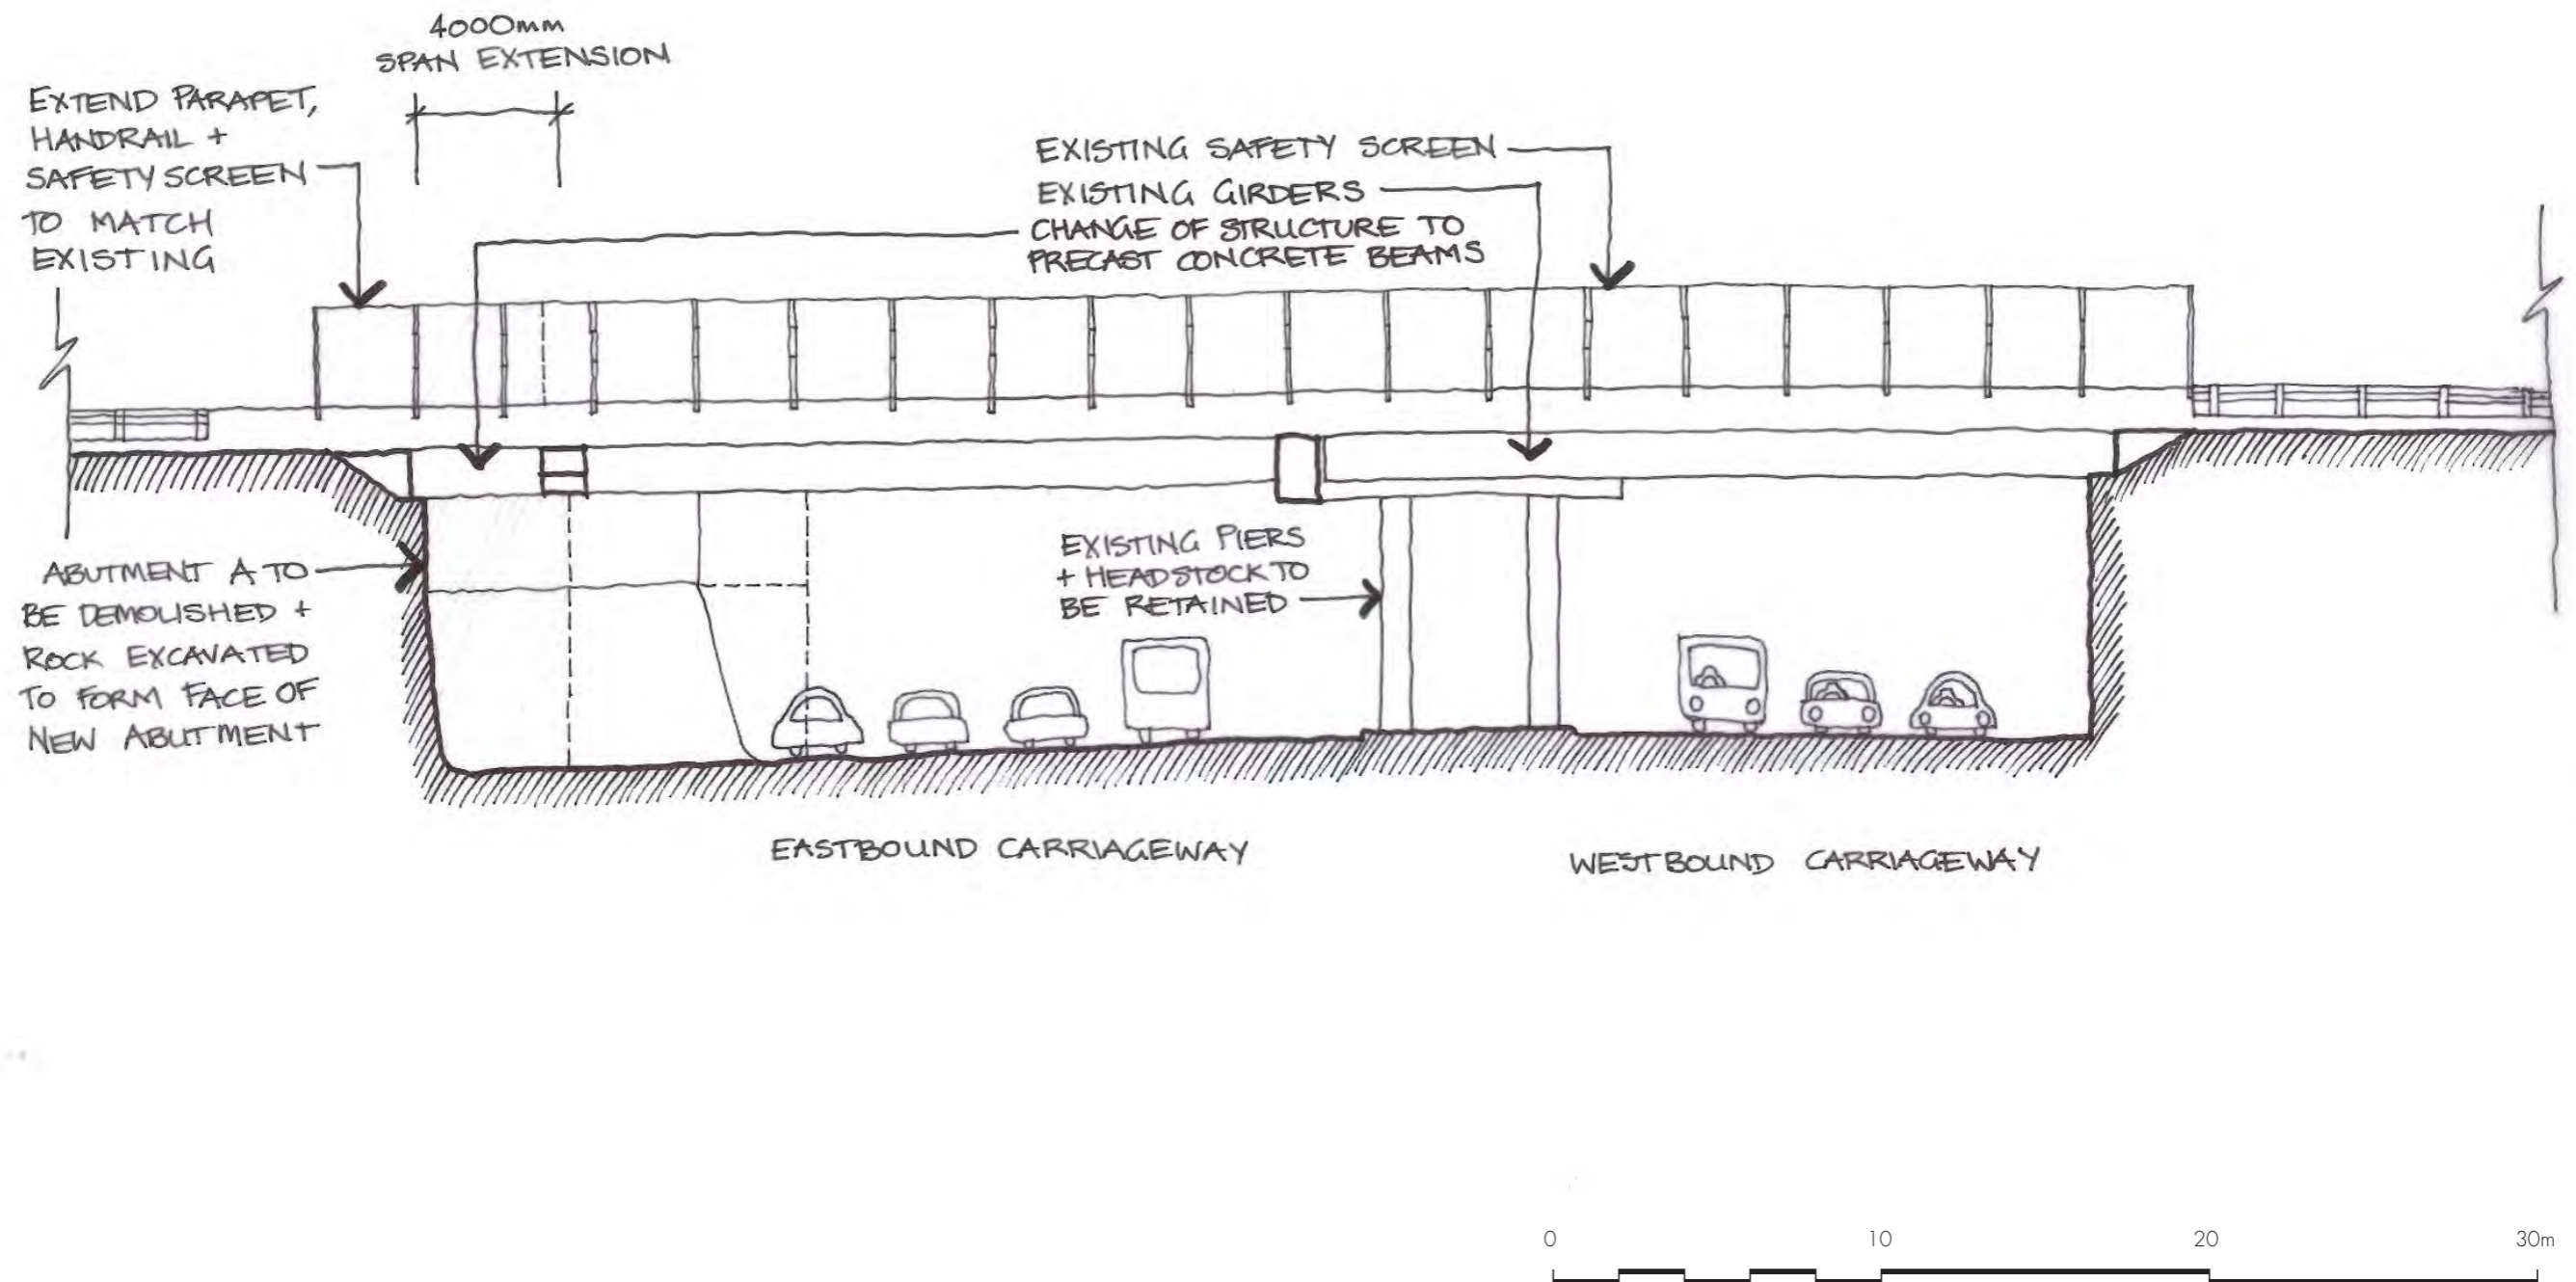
Bridge 2.2 Barclay Road Overbridge - Elevation
